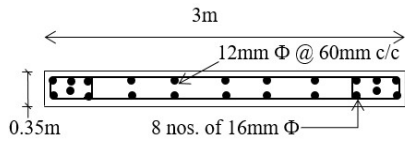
Reinforcement details of wall specimen analysed with different boundary element transverse reinforcement ratios
